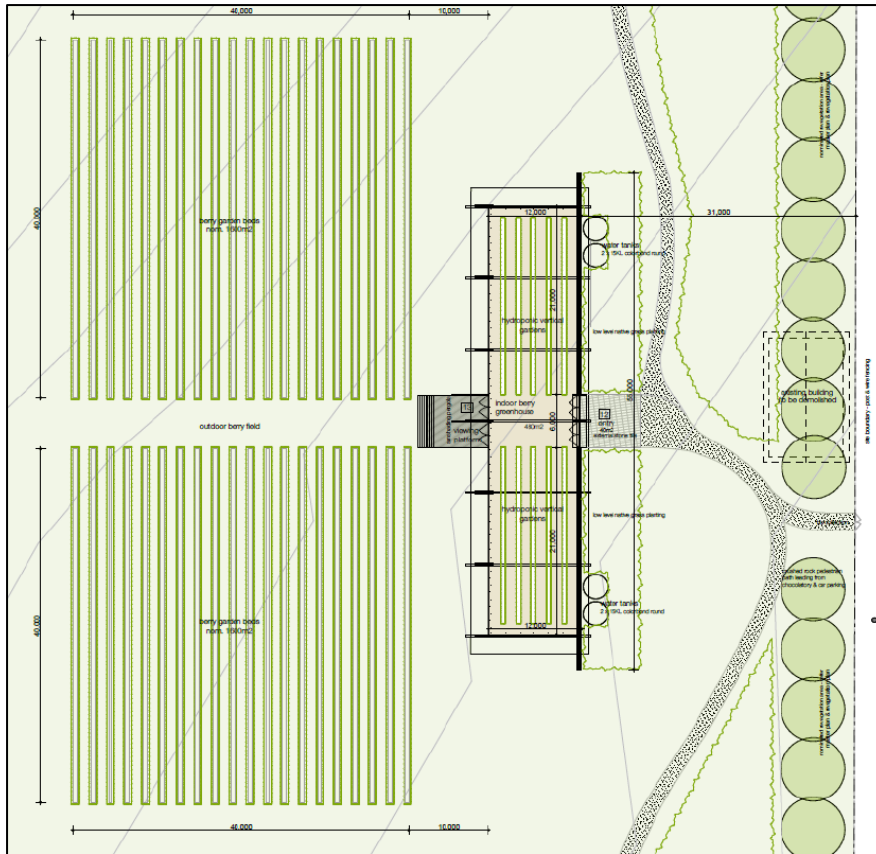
Plan of greenhouse, primary sales and berry picking area. Source: Application documents.
